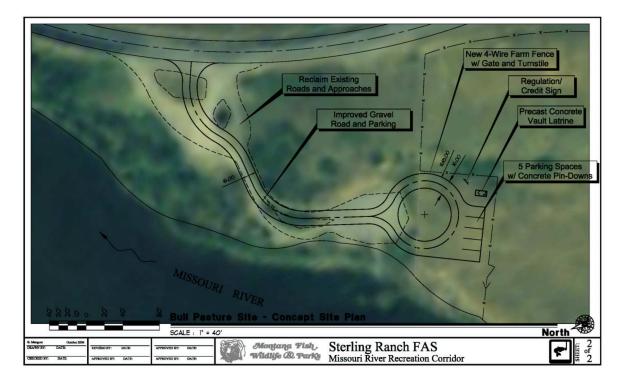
Proposed Bull Pasture FAS Overall Concept Site Plan
